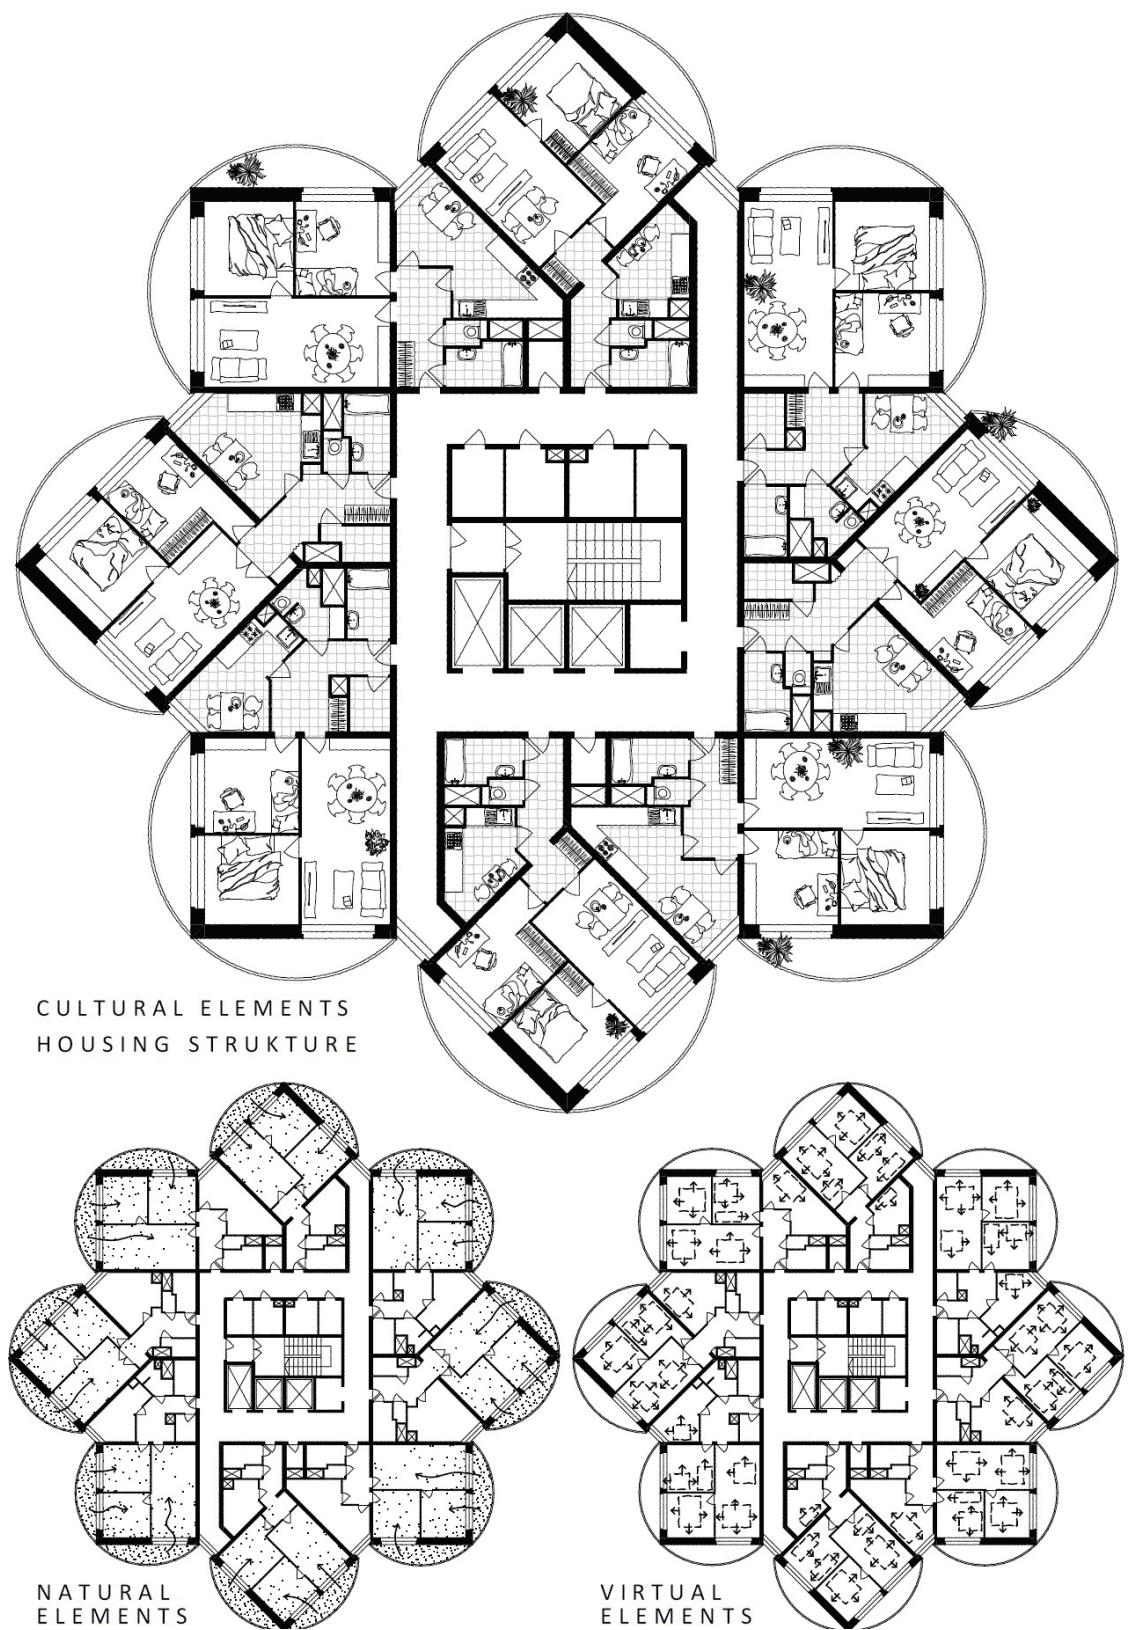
Kukurydza building – a repetitive floor plan. Analysis of apartment structure with consideration of cultural, natural and virtual elements
